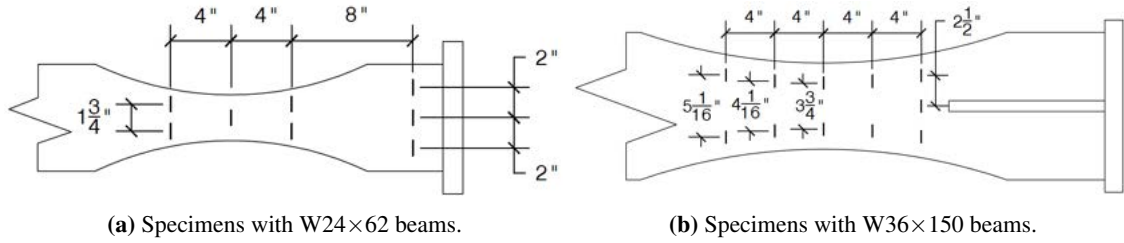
Dimensioned artifact layouts for full-scale specimens.
